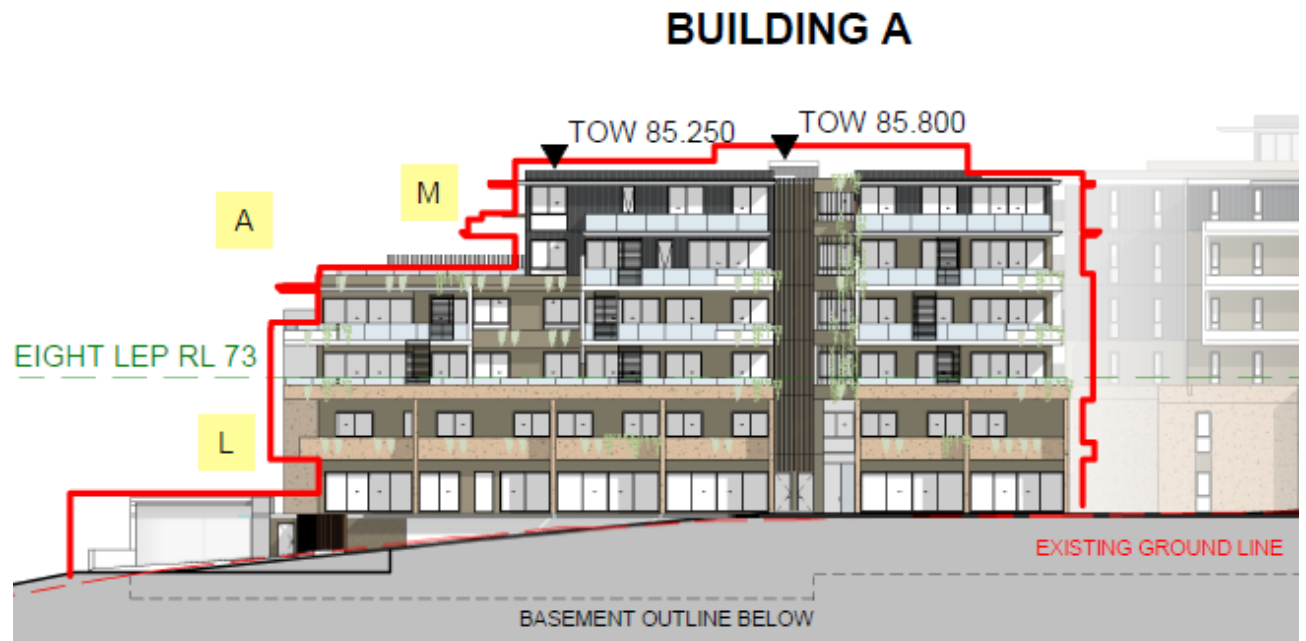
Proposed modified Building A façade and southern vehicle entrance
